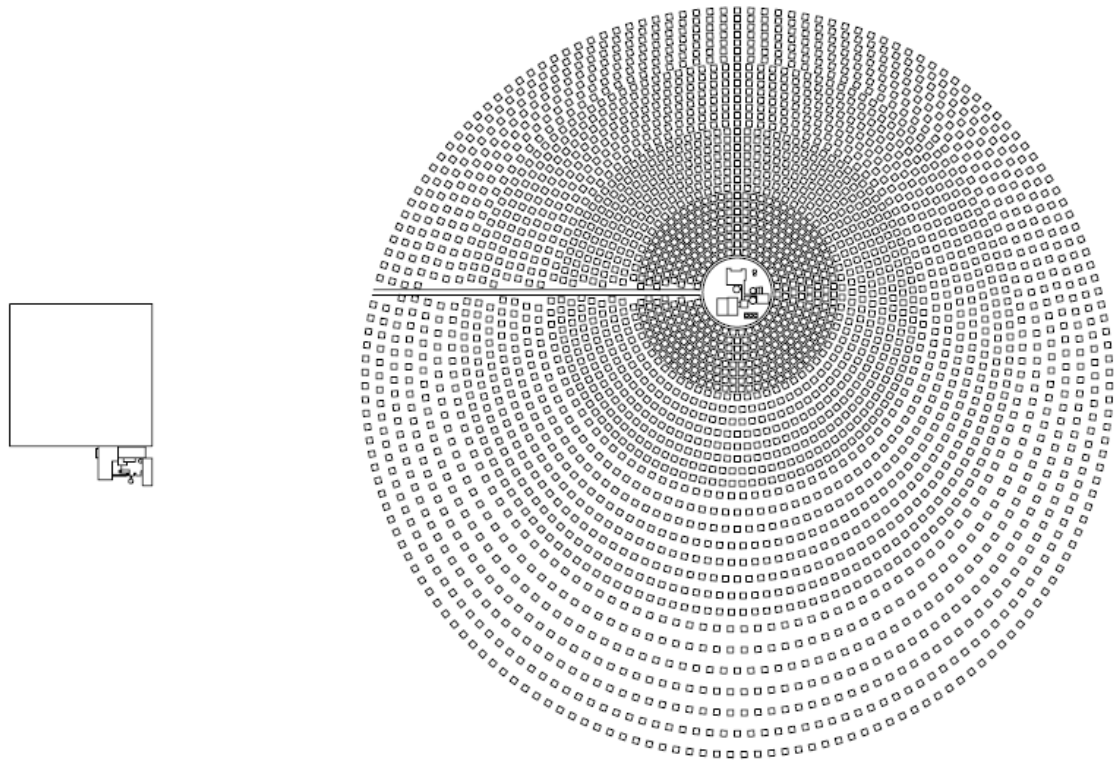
Layout of a power tower power plant with a biomass boiler and storage facility.
